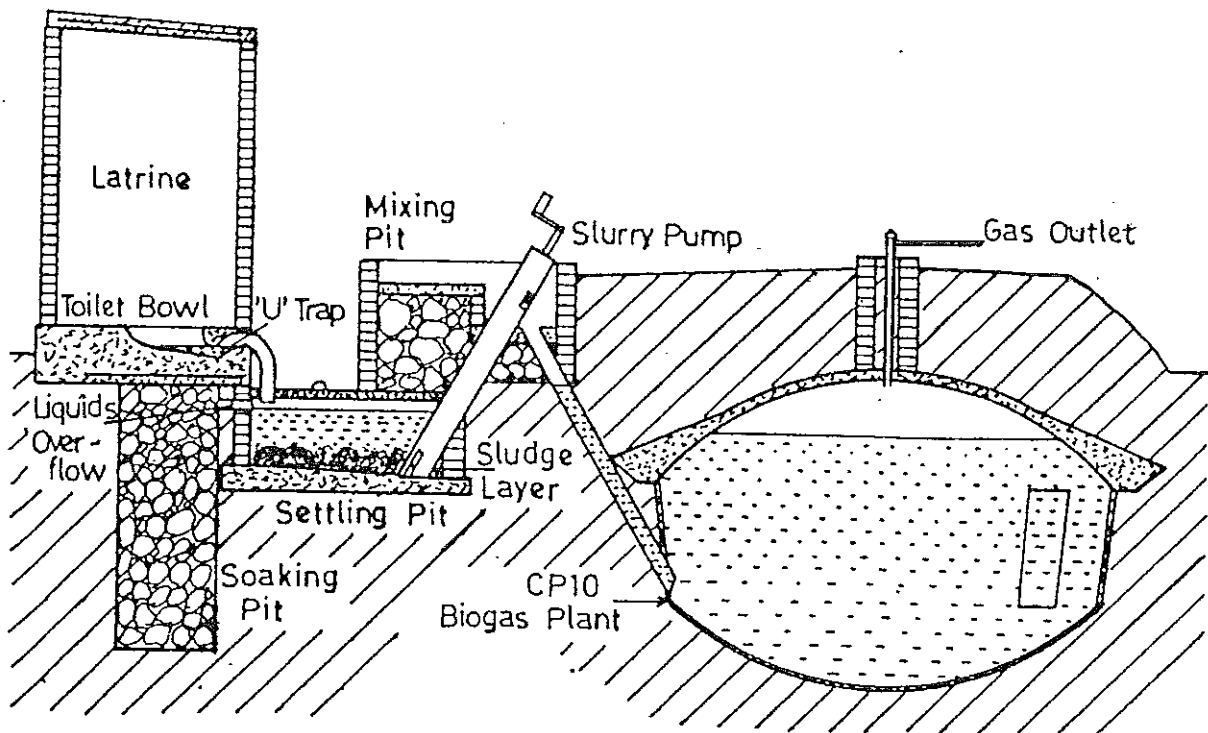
Use of Settling Pit and Slurry Pump with a Latrine
